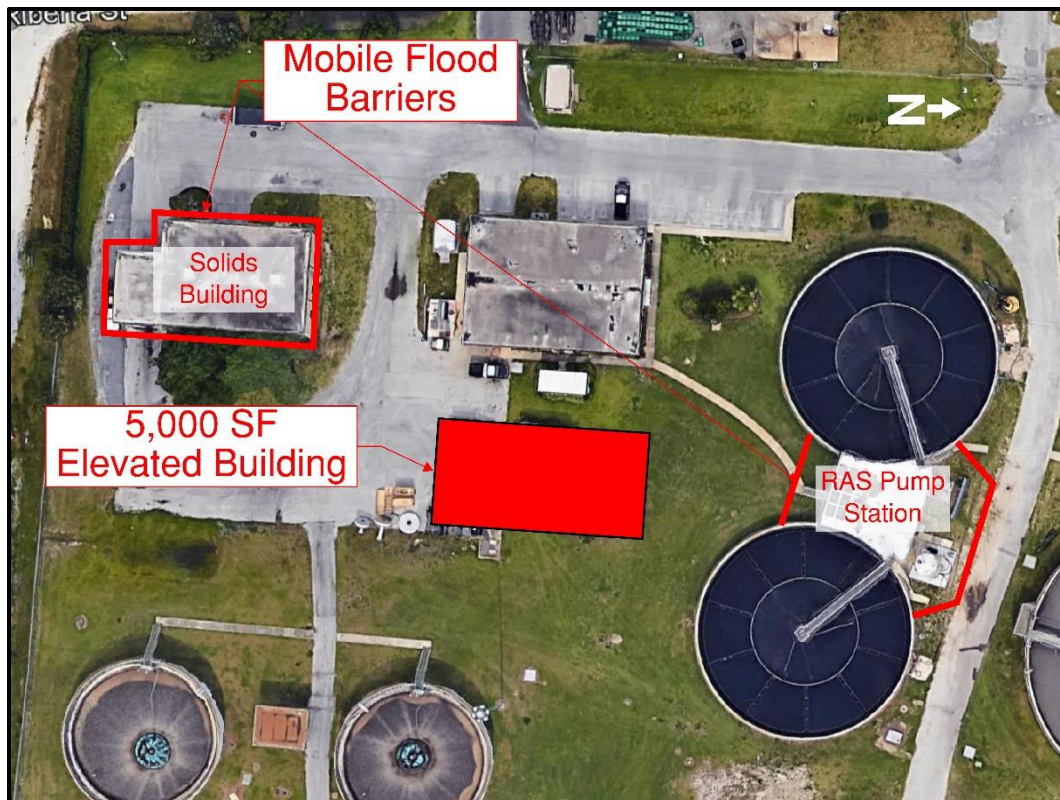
Possible Location and Footprint for an Elevated Building to Relocate Electrical Equipment
